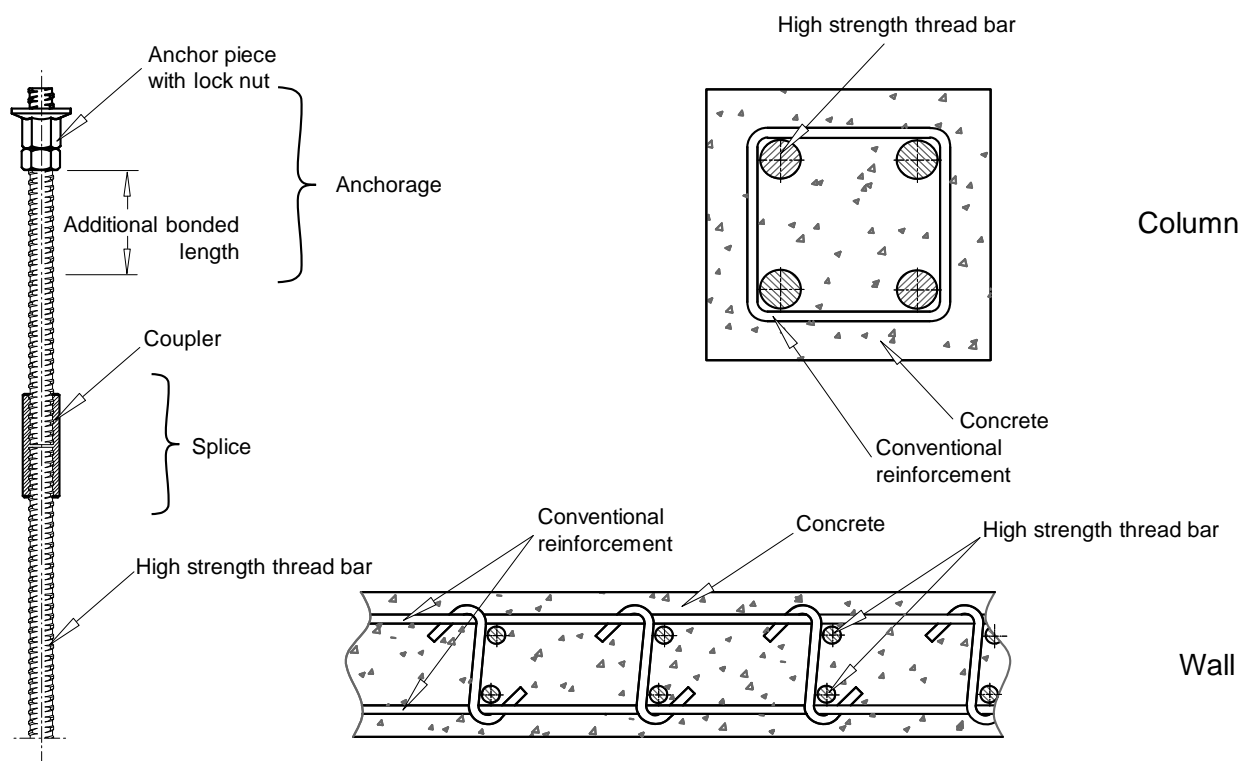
Thread bar with anchorage and splice – Cross sections of reinforced concrete members – Schematic examples
